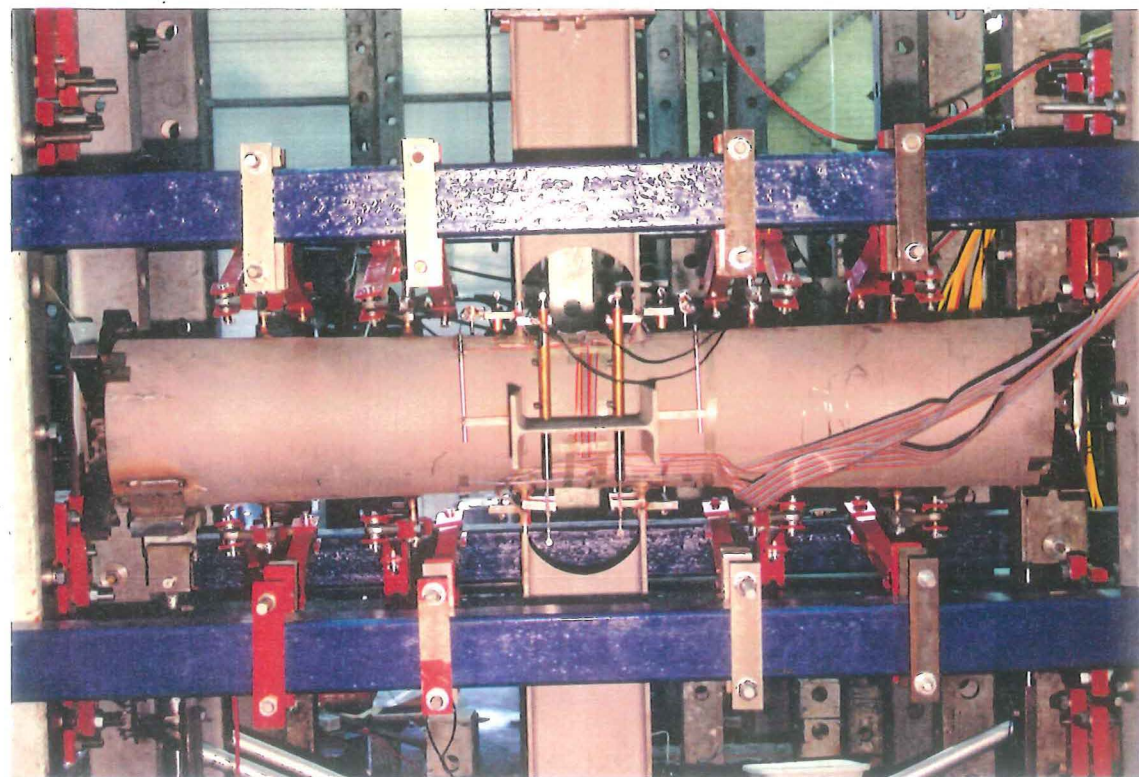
Test rig for series 1 and 2, specimen 2C1, with
